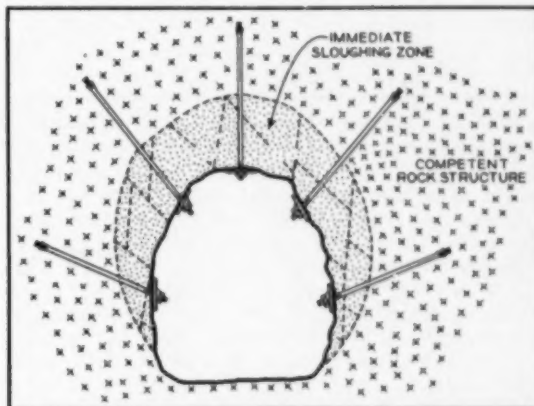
Rock bolting prevents sloughing in underground openings and stabilizes the surrounding area.
